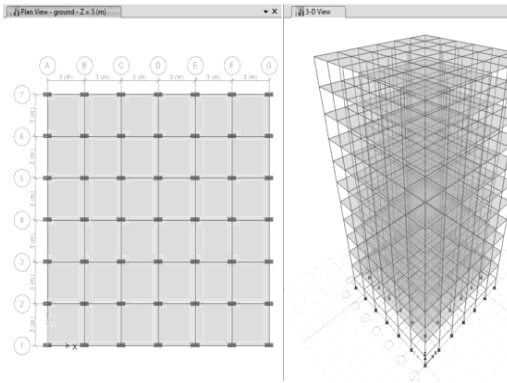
Model:1 Conventional Frame (Building without shearwall)
